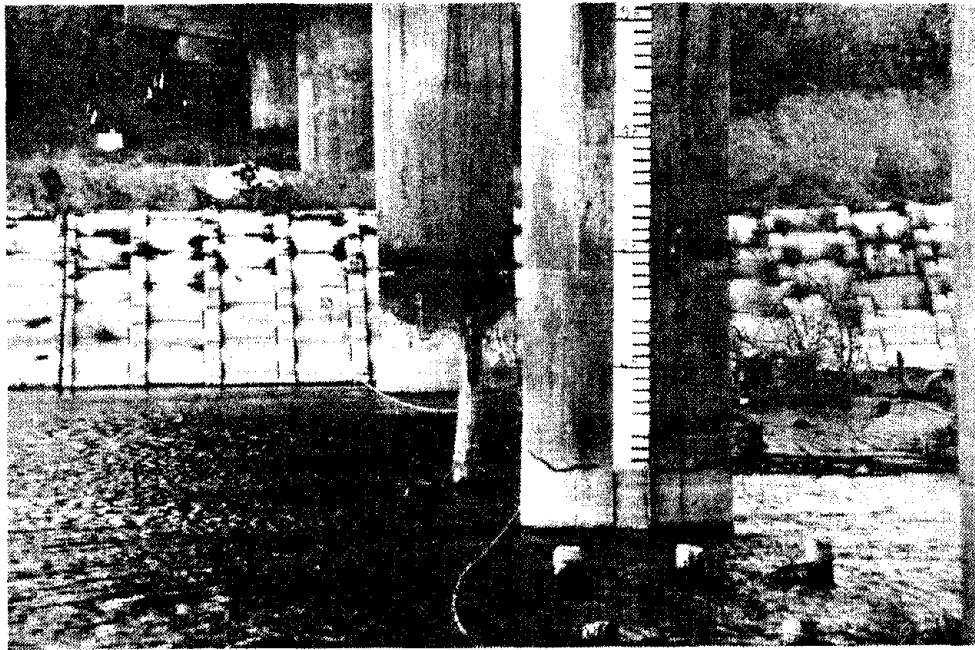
B View of Assabu bridge piers--note cracking near waterline.
